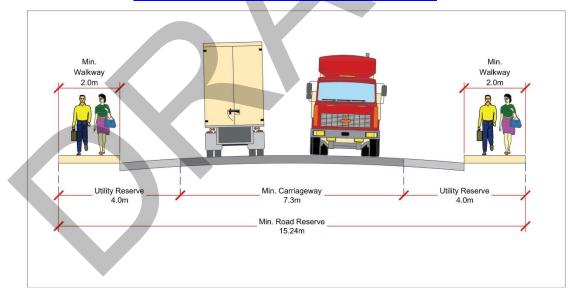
Cross-section of I-1 rand I-2 roads.
